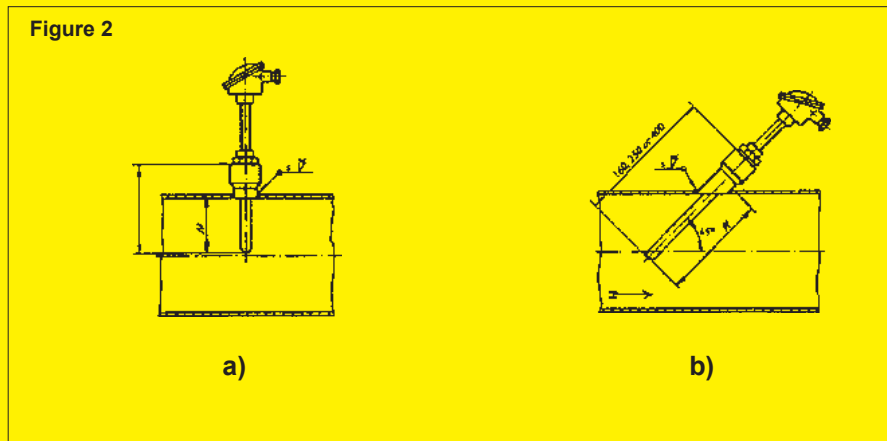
shows the different positions of the mounting boss. Sensor or thermometer is usually mounted perpendicularly (a). If dimension N is greater than 3/4 of the pipe diameter, position b will be used.
